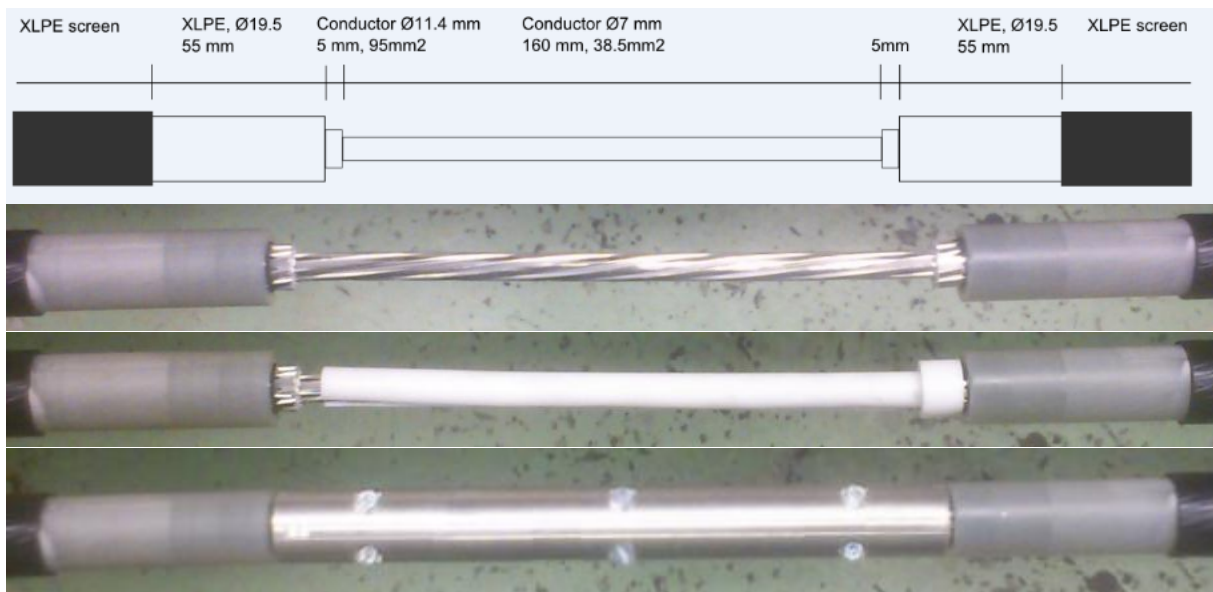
Joint ferrule replacement simulating contact failure. From the top: -Dimension drawing -XLPE cable with reduced cross section - Insulating teflon piece - Metal cylinder.
